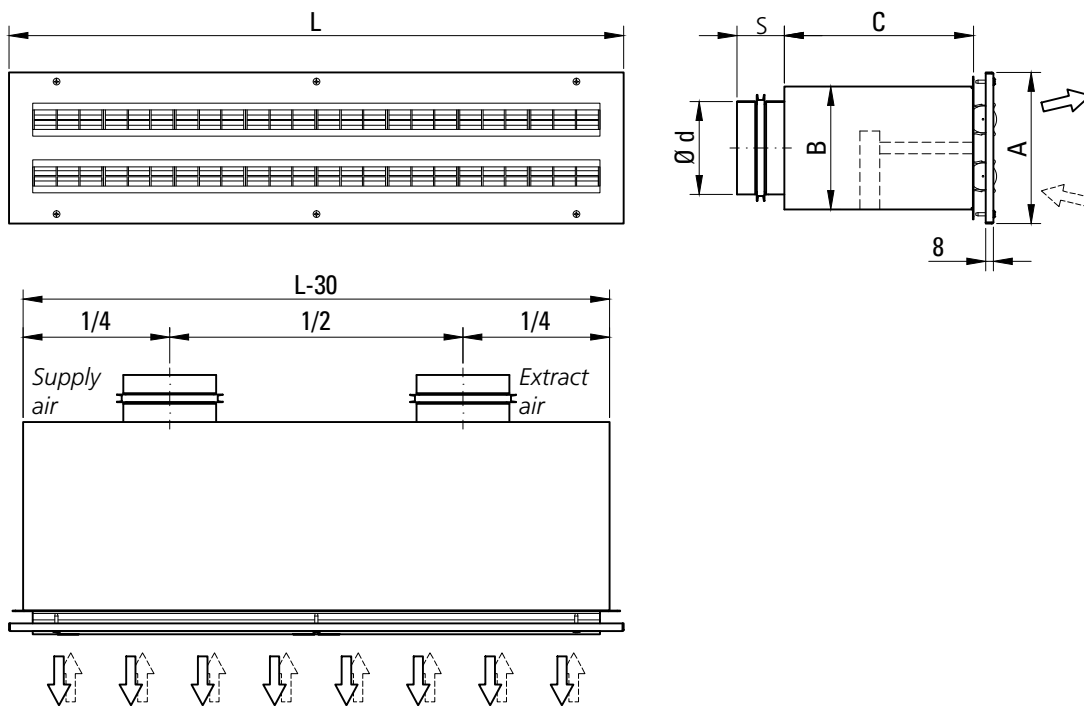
Dimensions, VAR with horizontal separation between the supply and extract air (mm).
